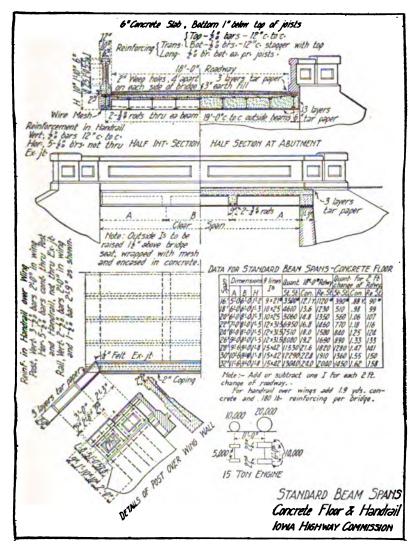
STANDARD BEAM BRIDGE. IOWA HIGHWAY COMMISSION.
